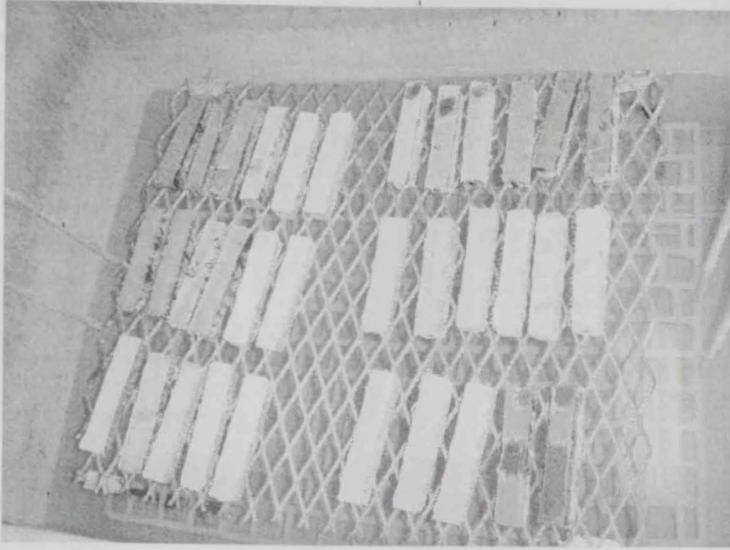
Concrete Specimens reinforced by FRP exposed to saturated environment.
